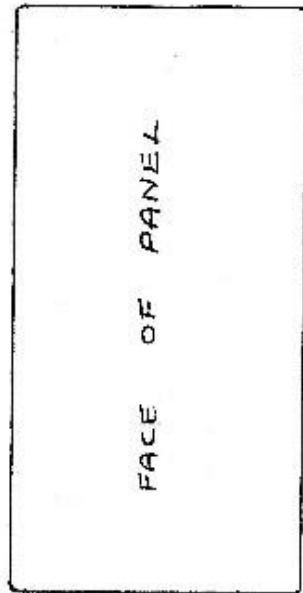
Interpretation Panel Mounting Frame Sheet 1 of 2
